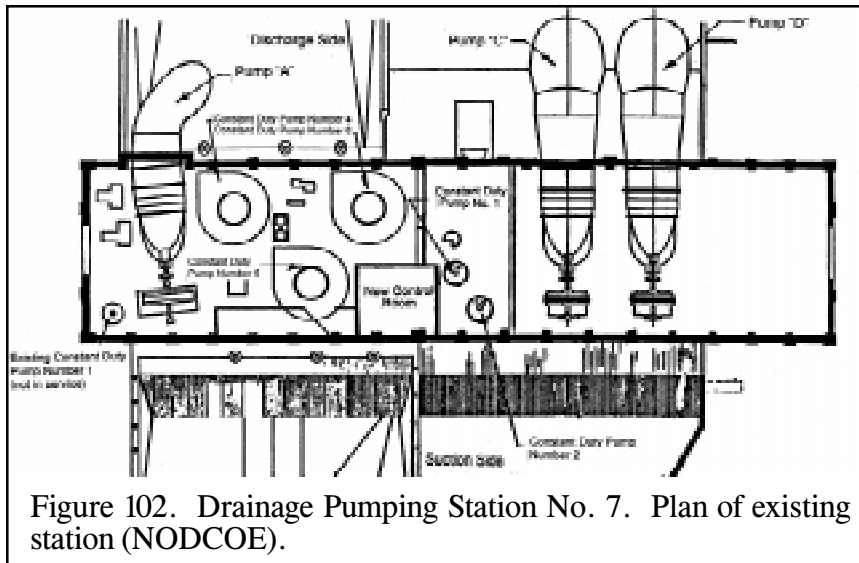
Drainage Pumping Station No. 7. Plan of existing station (NODCOE).
